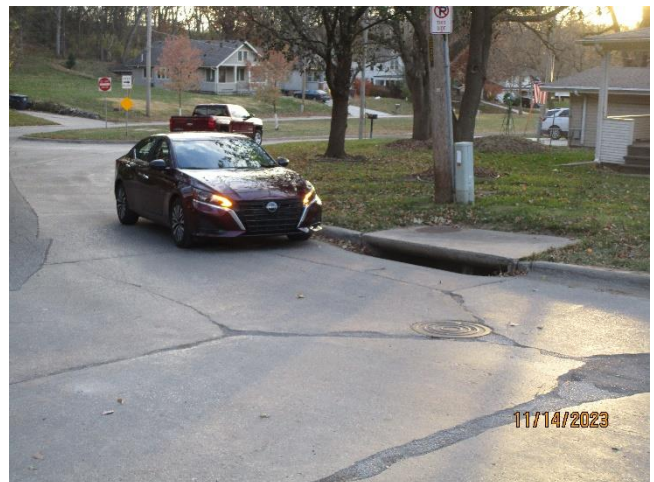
Exhibit A: Looking west at the existing driveway (10/31/23)
